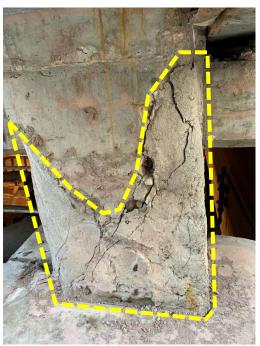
Cracked and unsound previous concrete repair at Column 10A. Eight grout pockets are visible at the ends of the beam PT tendons.
